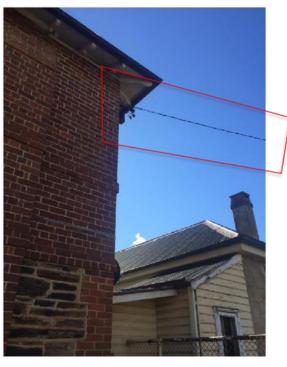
Typical newer wiring addition to the Gaolers Residence
